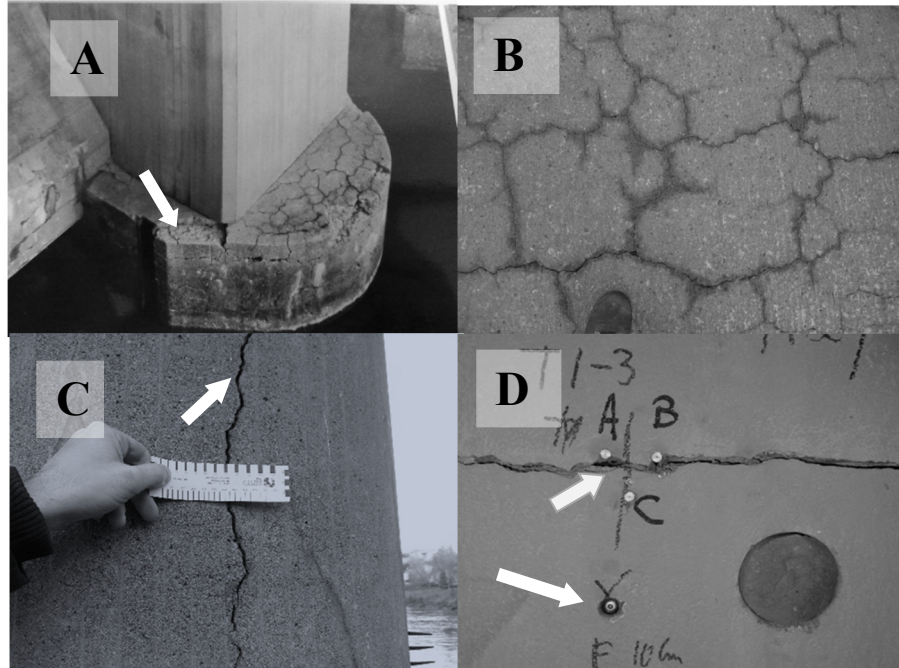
Norwegian structures. A: hydropower dam foundation heavily damaged by ASR. Note concrete fragments have broken off (arrow). B: map cracking in airfield pavement. C: longitudinal crack in bridge column (arrow) and crack width gauge. D: crack in a hydro power plant wall due to ASR mounted for three point's measurement (upper arrow) and relative humidity 5 cm and 40 cm in the concrete (lower arrow) and the hole from core taking.
